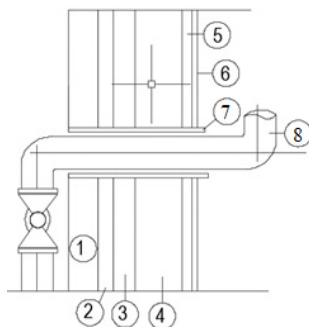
Gas pipeline construction model through a frame-type building external wall SIP panel construction.
